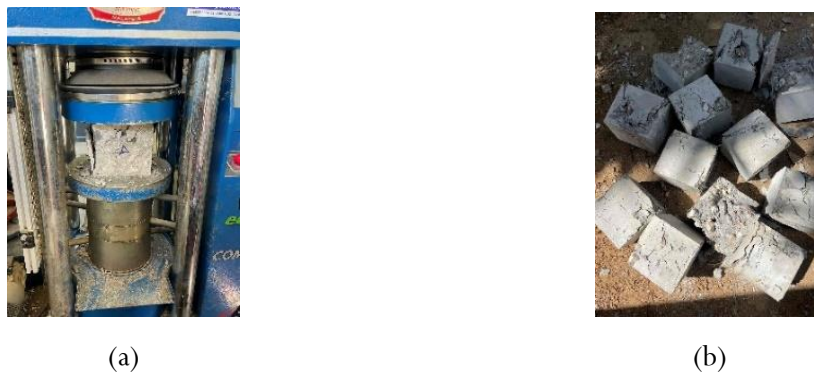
Cube testing. (a) Concrete cube test, and (b) Concrete cubes after compressive failure
